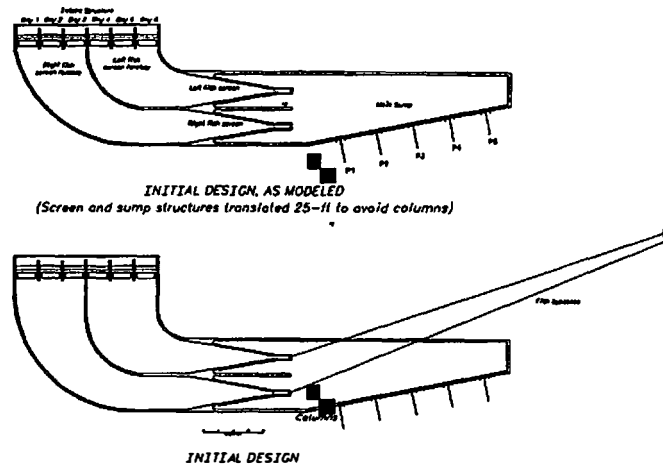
Plan views comparing initial design and the layout modeled in the laboratory. The structure plan was modified to avoid the laboratory columns.
